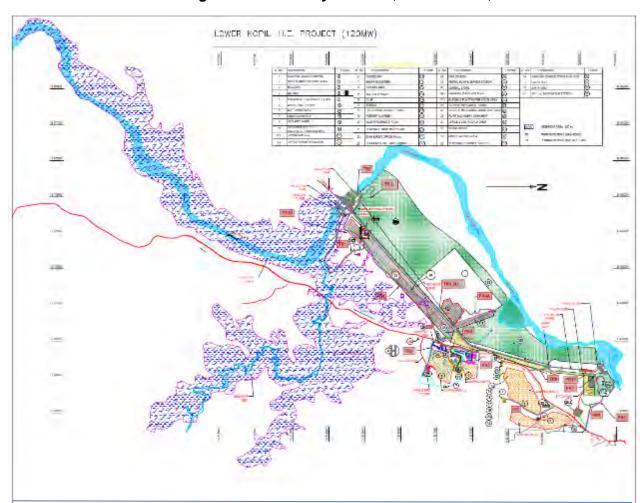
Detail Layout Plan (as on 30.06.2023)
